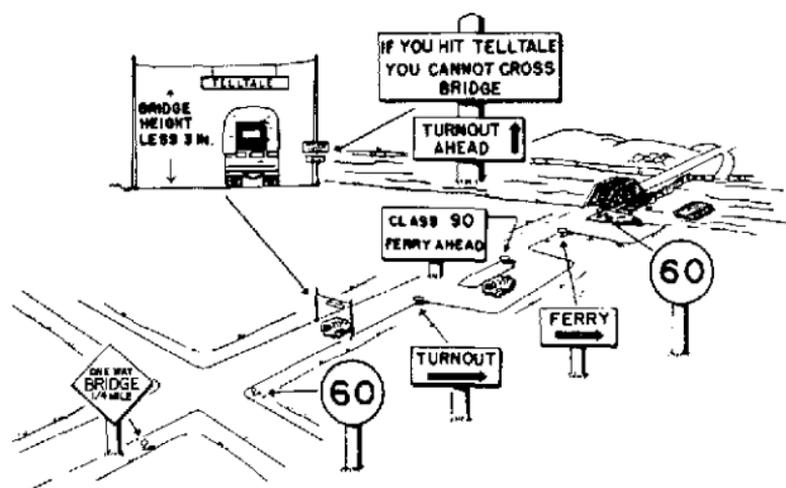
Typical single-lane bridge applications of bridge class and information signs and road guide signs.
